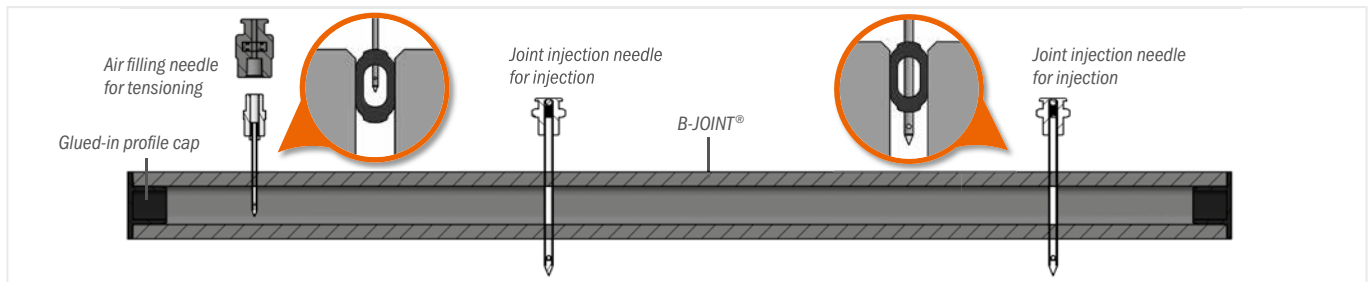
B-JOINT® - Sealing and injection profile for sealing and injecting leaking movement joints
